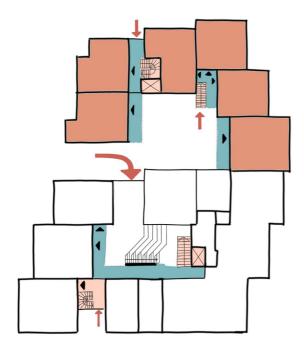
Schematic floor plan of the ground floor of Vindmøllebakken
